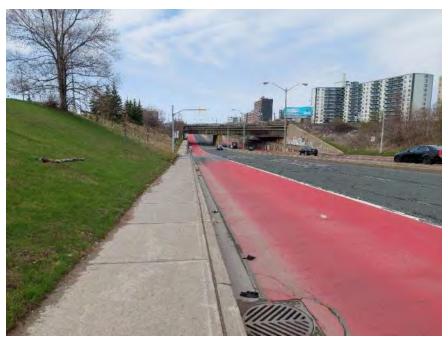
Eglinton Avenue East with the bridge carrying the Lakeshore East rail corridor, looking west (A.S.I., 2023).
